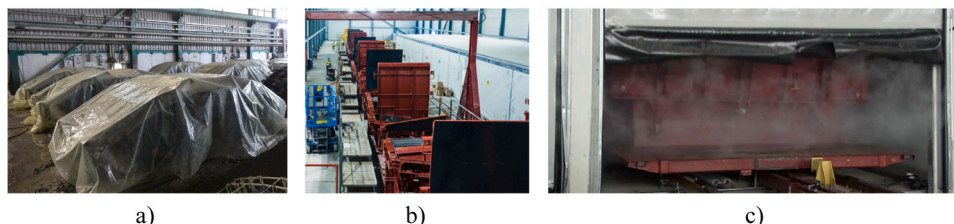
Segment production methods. a) Static moulds; b) Carousel system; and c) Steam-curing chamber.
